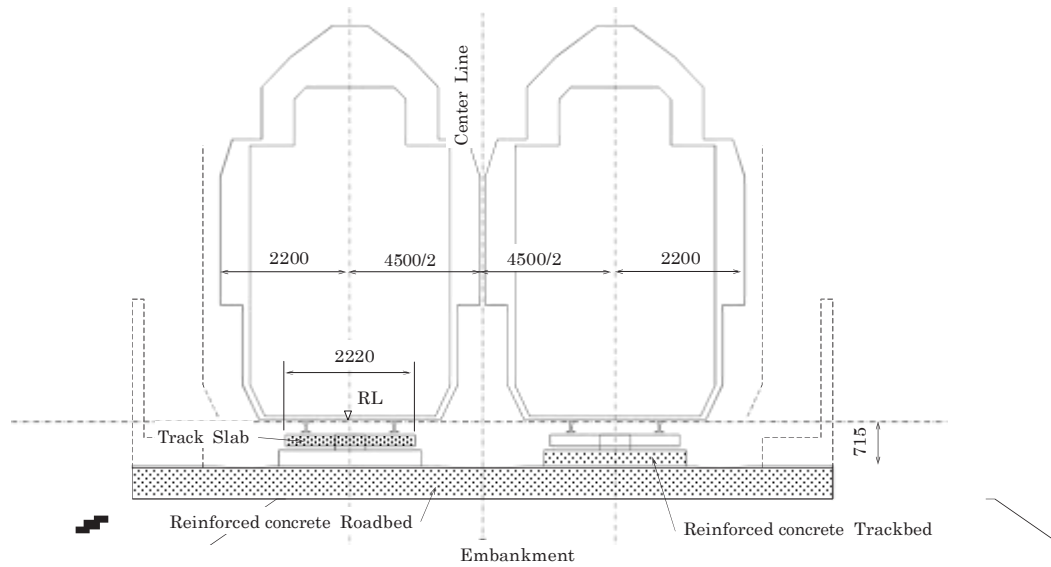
Slab Track Standard Cross-section (Embankment sections)
